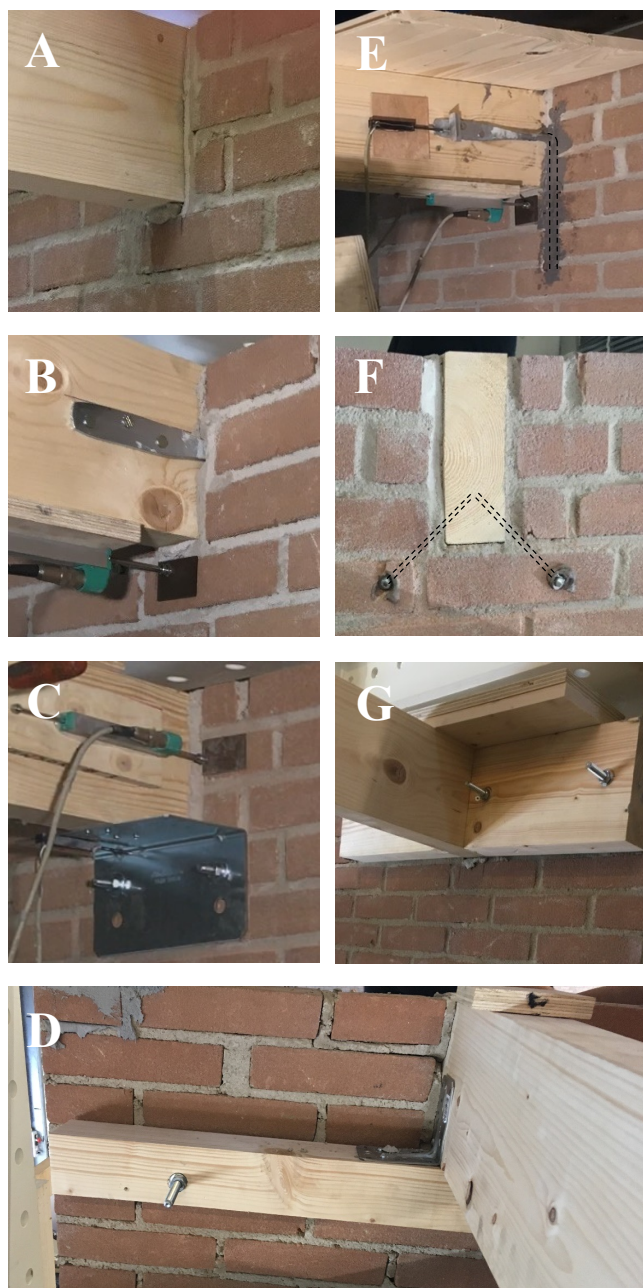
Overview of the seven configurations tested in the second phase: as-built with mortar pocket (A); as-built with hook anchor (B); strengthened with steel angle (C); strengthened with additional joist and steel brackets (D); strengthened with hook anchor glued into the wall (E); strengthened with two screws glued into the wall (F); strengthened with timber blocks (G).
